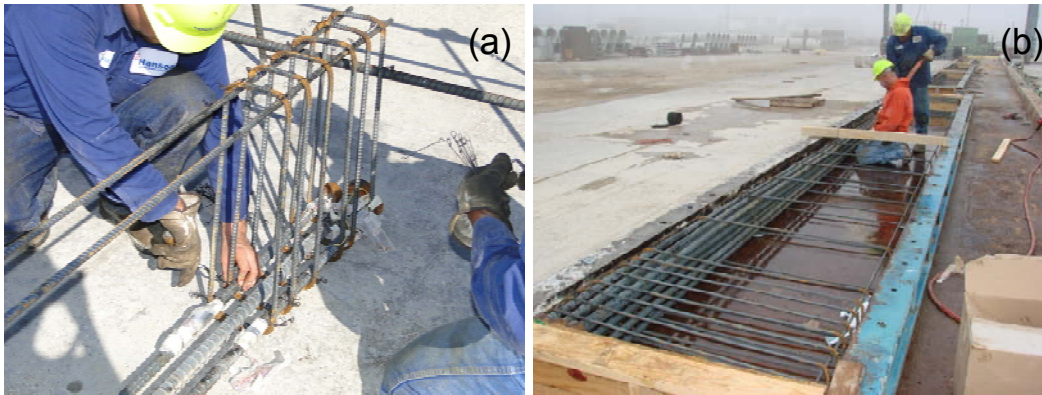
Typical photo of reinforcement caging and formwork for SFRC beams with the height greater than 24" at Hanson Pipe & Precast Plant
